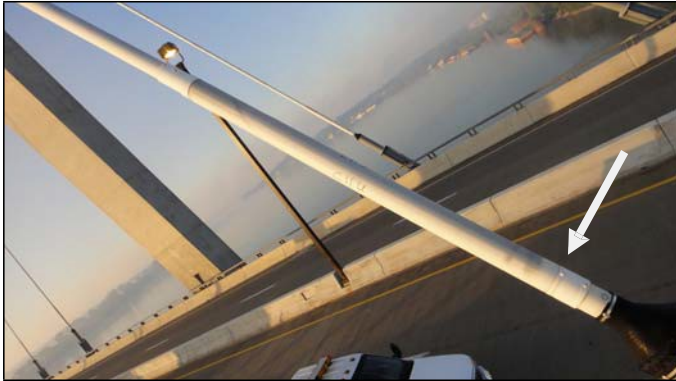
C11U: Bottom Coupler Crack near Butt Weld to the Larger Diameter Pipe Crack Origins at 90° and 270°
